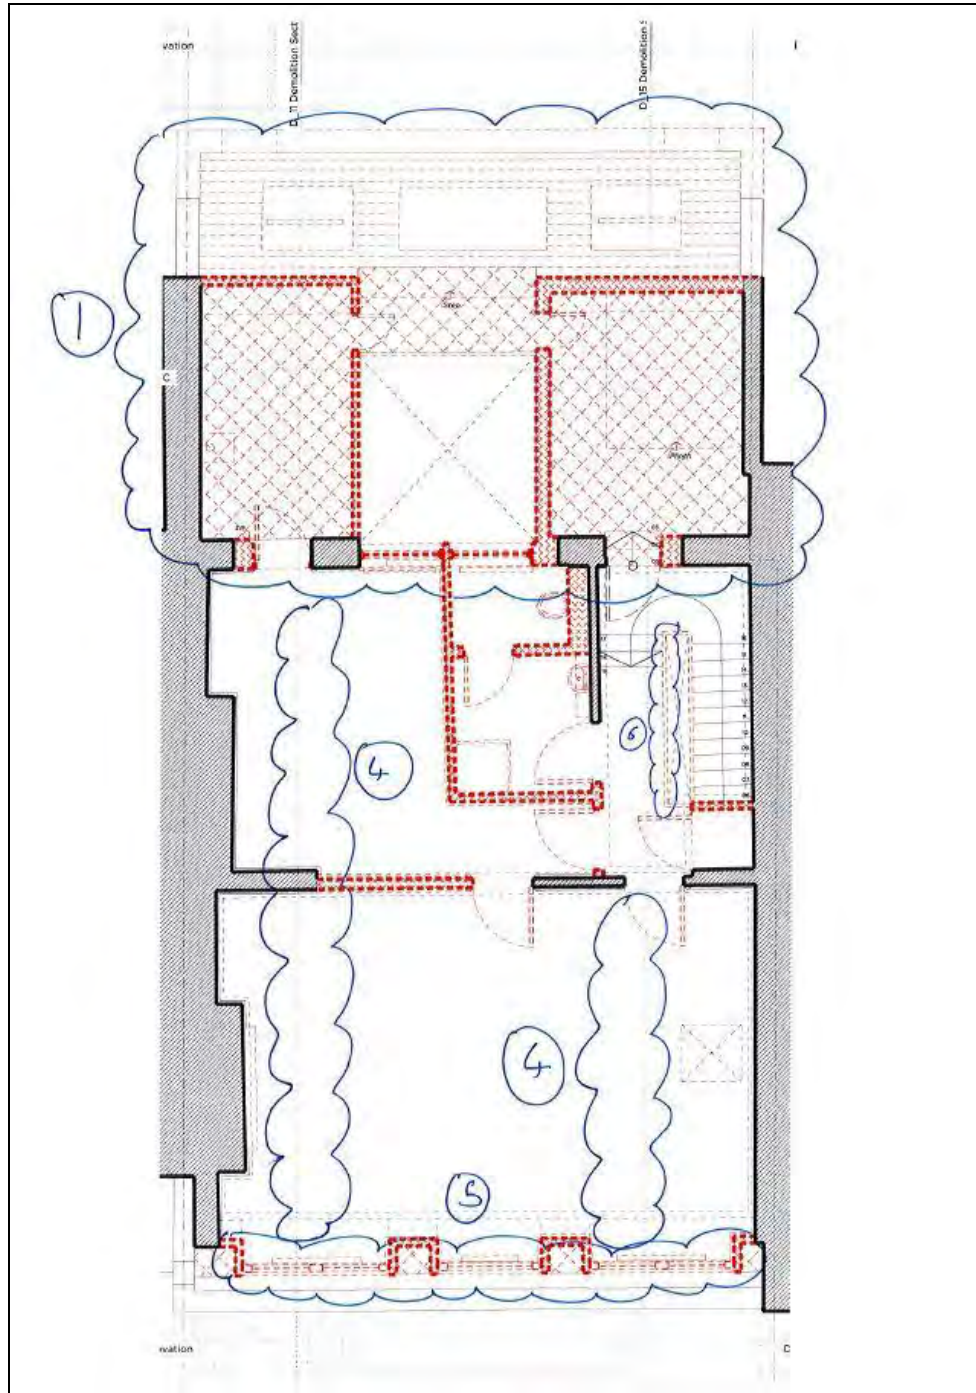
Existing Third Floor Layout (Demolition shown in red)
